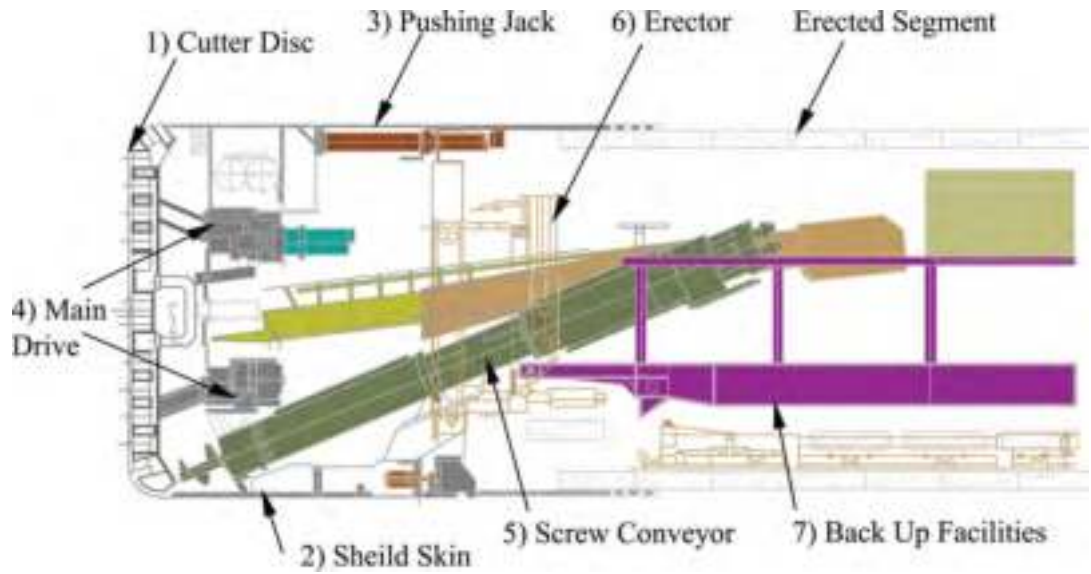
Typical Layout of a TBM (Andrew Hung Shing Lee, Engineering Survey System for TBM, 2007)
